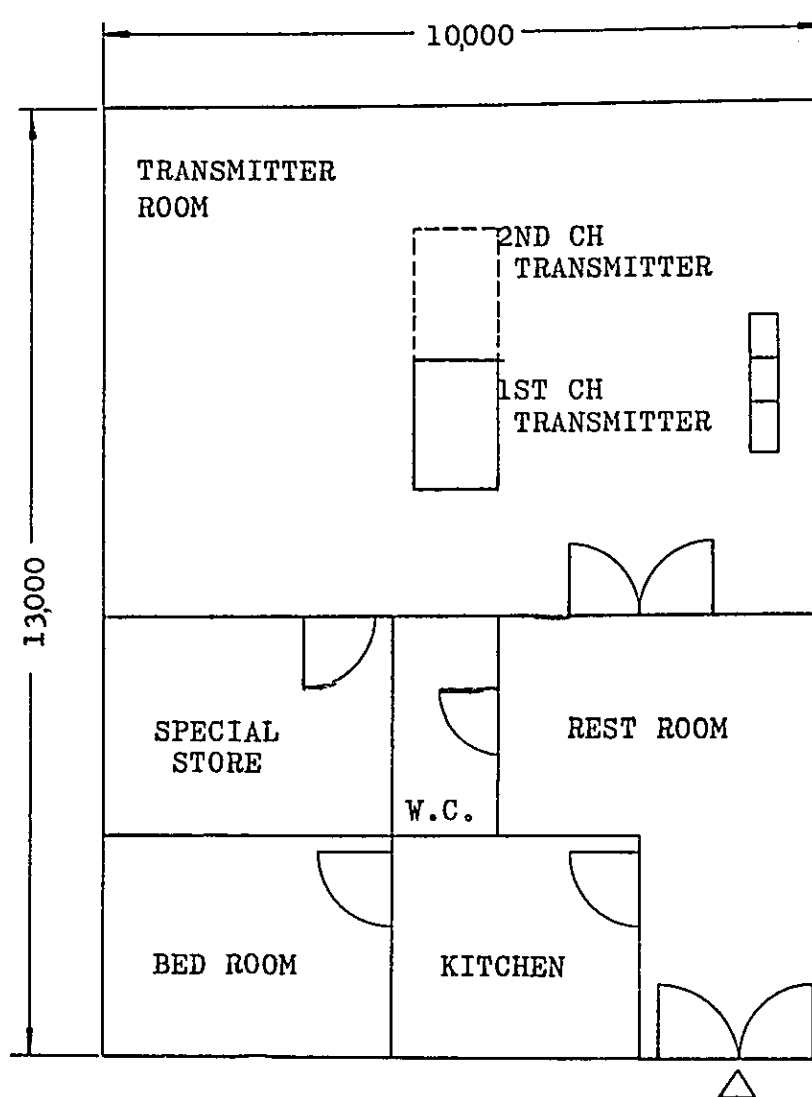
TYPICAL FLOOR LAYOUT FOR TV TRANSMITTING, (10KW x 2) STATION
